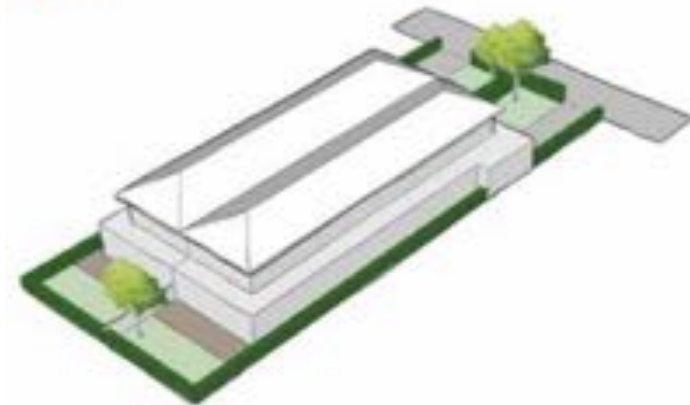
Typical dual occupancy constructed without the new 35% minimum garden area requirement
